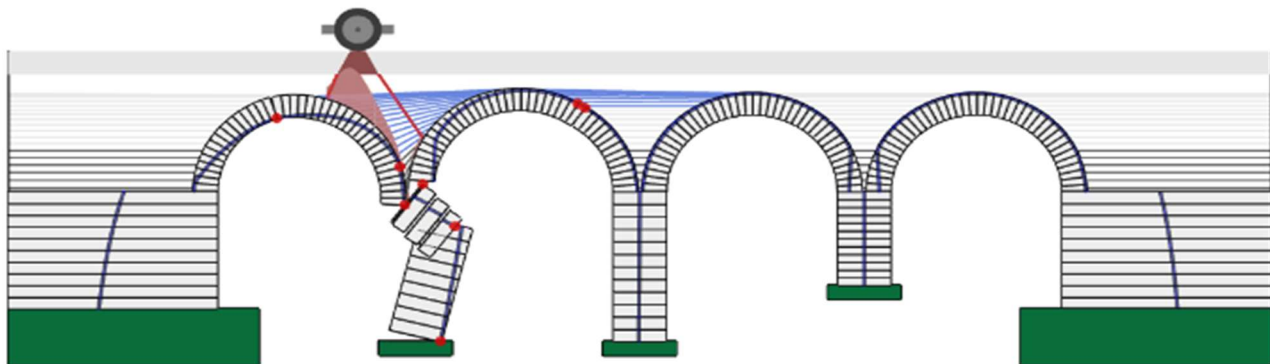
failure process of the bridge, where the pier was weakened
